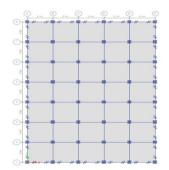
Plan view of modelled reinforced concrete structure system with friction damper
